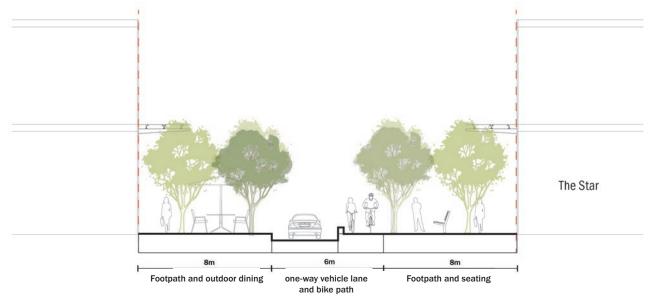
/ Section 01 - Indicative Union Street East Outcome
